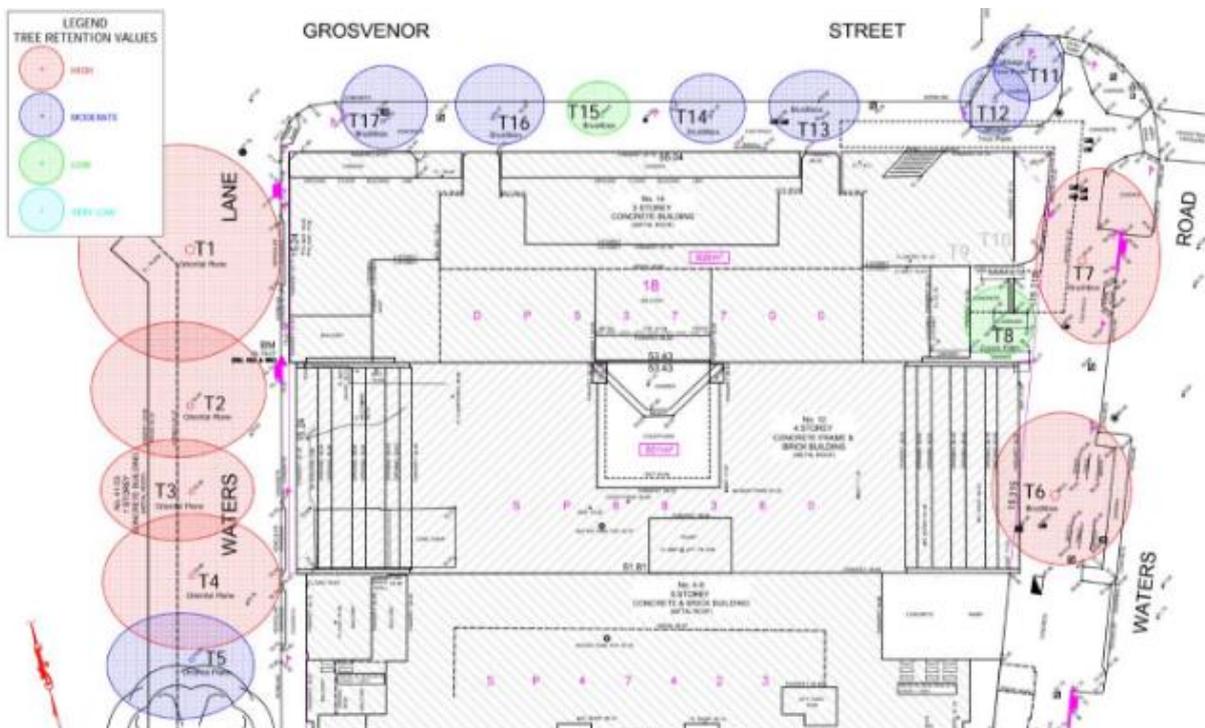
Extract from Tree Location Plan – (Source: Tree Impact Assessment Report)
